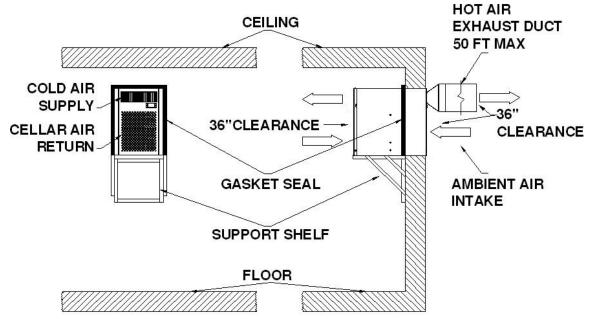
Through-wall Installation with hot-air exhaust duct (outside wall flush)
